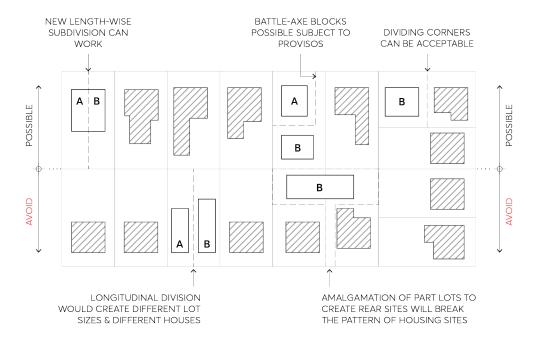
New subdivision, battle-axe and amalgamation of lots
